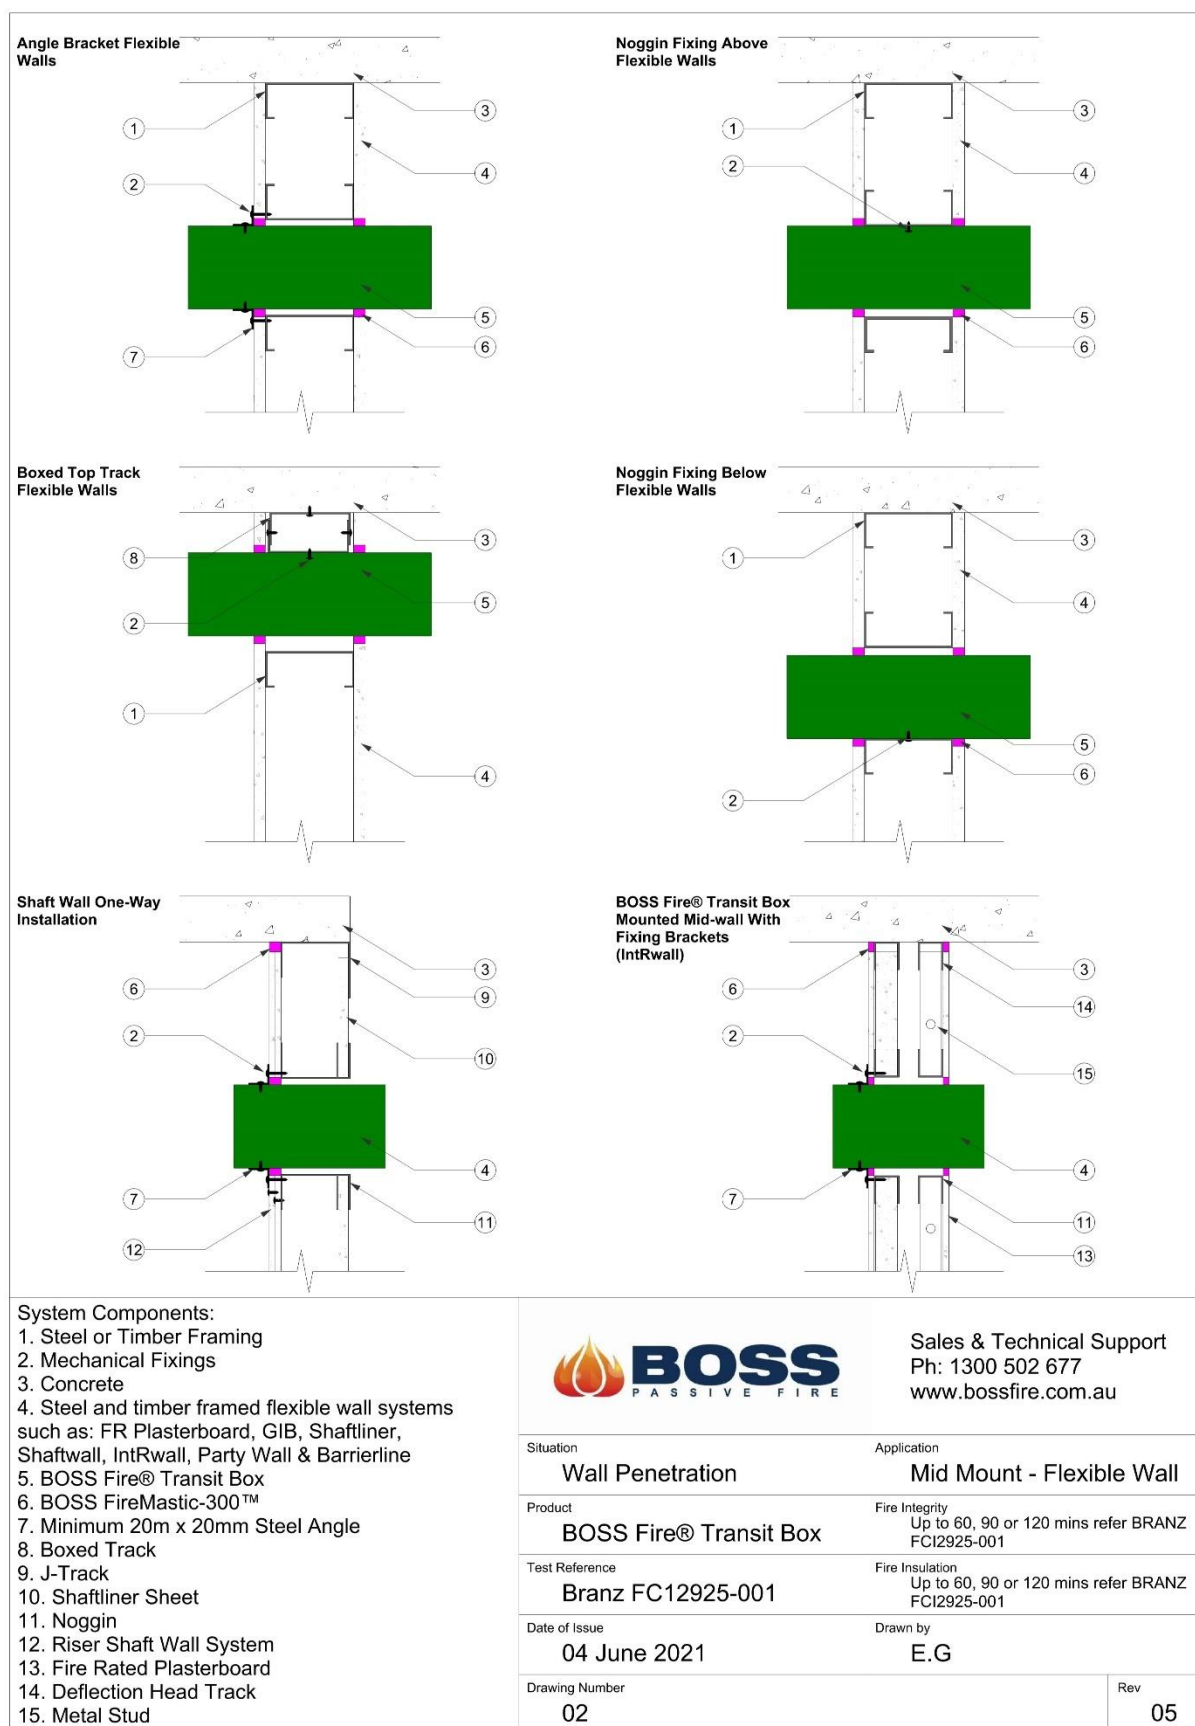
BOSS Fire® Transit Box – Mid, Soffit & Ceiling Mount in Other Wall Systems
